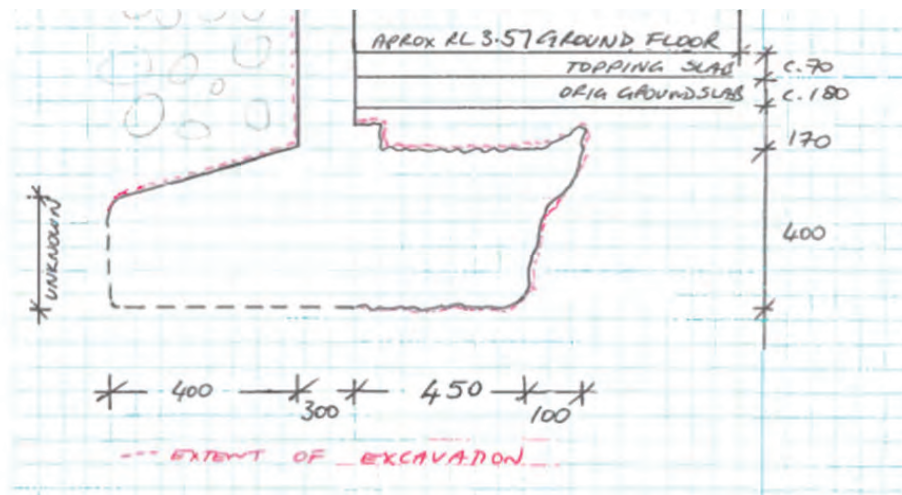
Retaining wall footing excavation – measured internally at 3-R/S and externally at 3-C/E.
